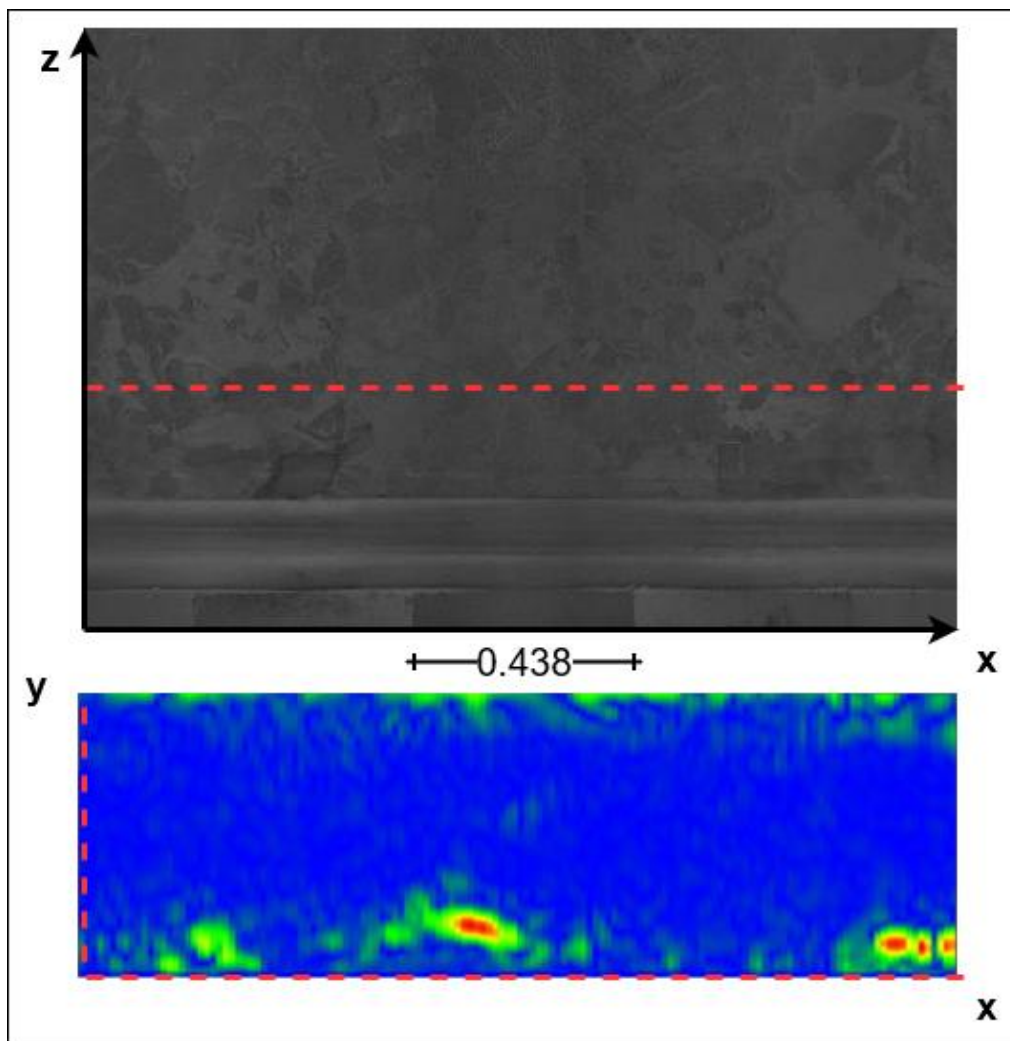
NIR developed photogrammetry-produced orthophoto of the lower left column and GPR slice of the column at $h = 0.619$ m from the floor (main façade).
